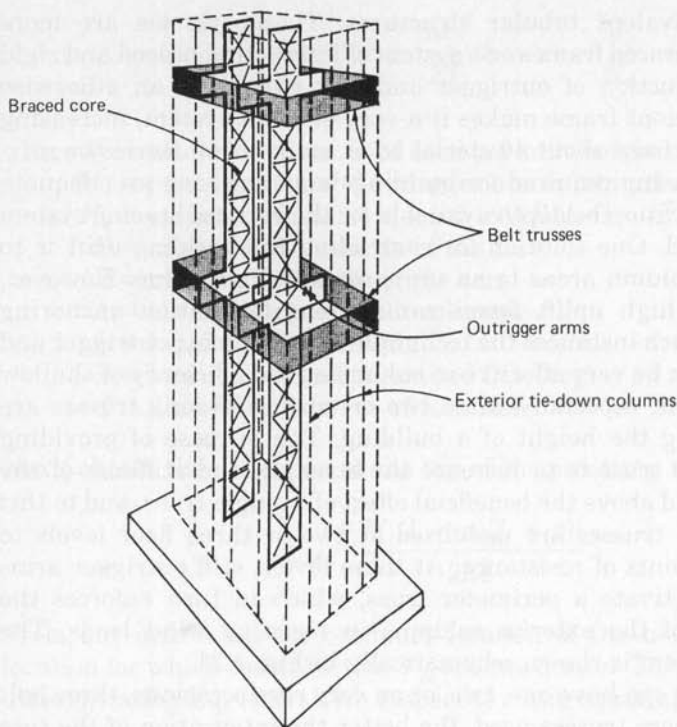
Schematic elevation of two outrigger and belt truss system.
